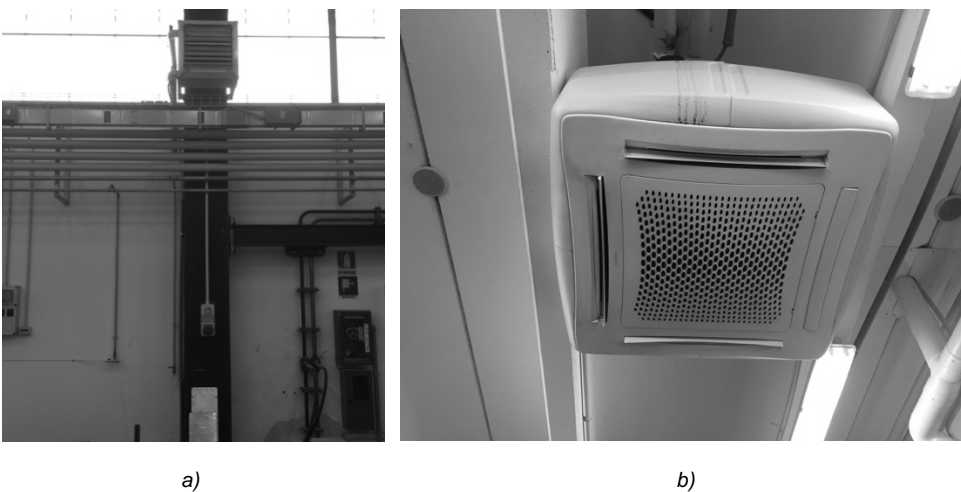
Example of non-structural elements installed in industrial facilities: a) heater and piping system; b) fan coil units installed in the offices.
